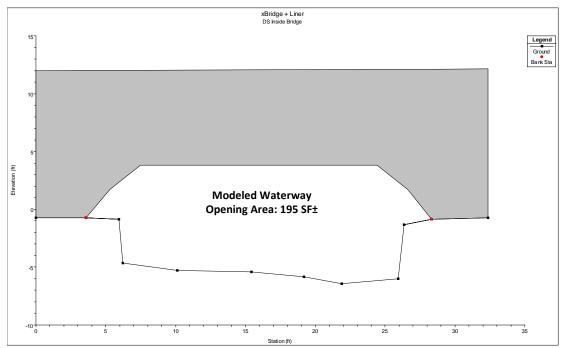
Bridge Rehabilitation Alternative 1 bridge outlet cross-section as modeled to account for geopolymer liner and sewer main obstructions
